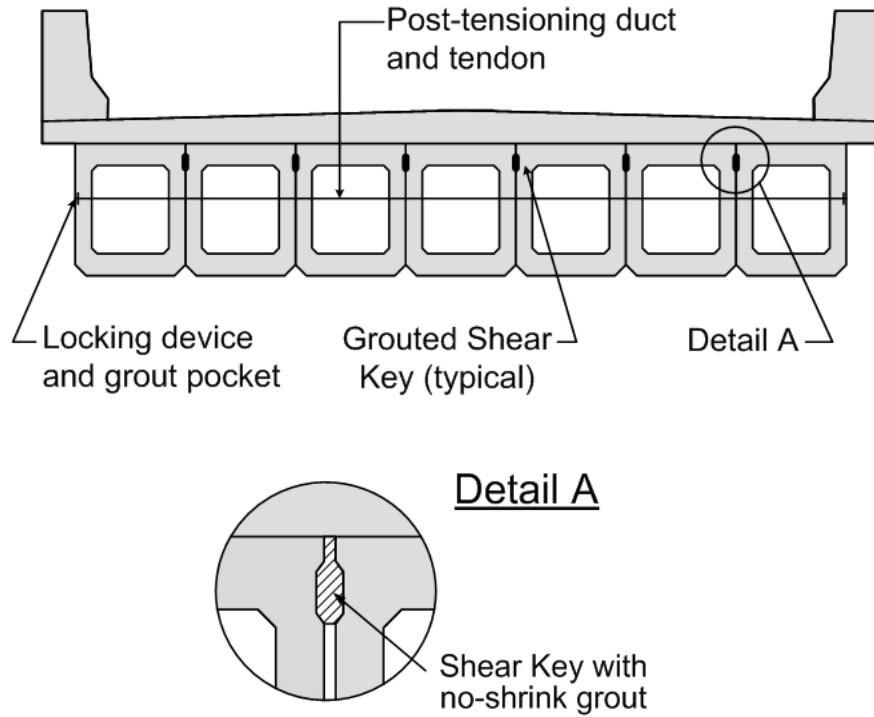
Transverse Post-tensioning of an Adjacent Box Beam Bridge
